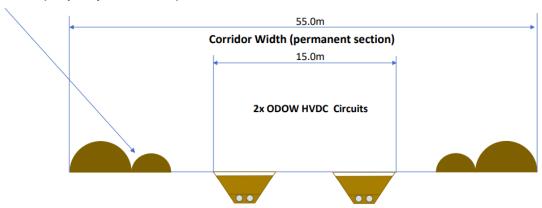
Example onshore cable construction corridor cross section for 2 HVDC cable circuits (4 cables)
